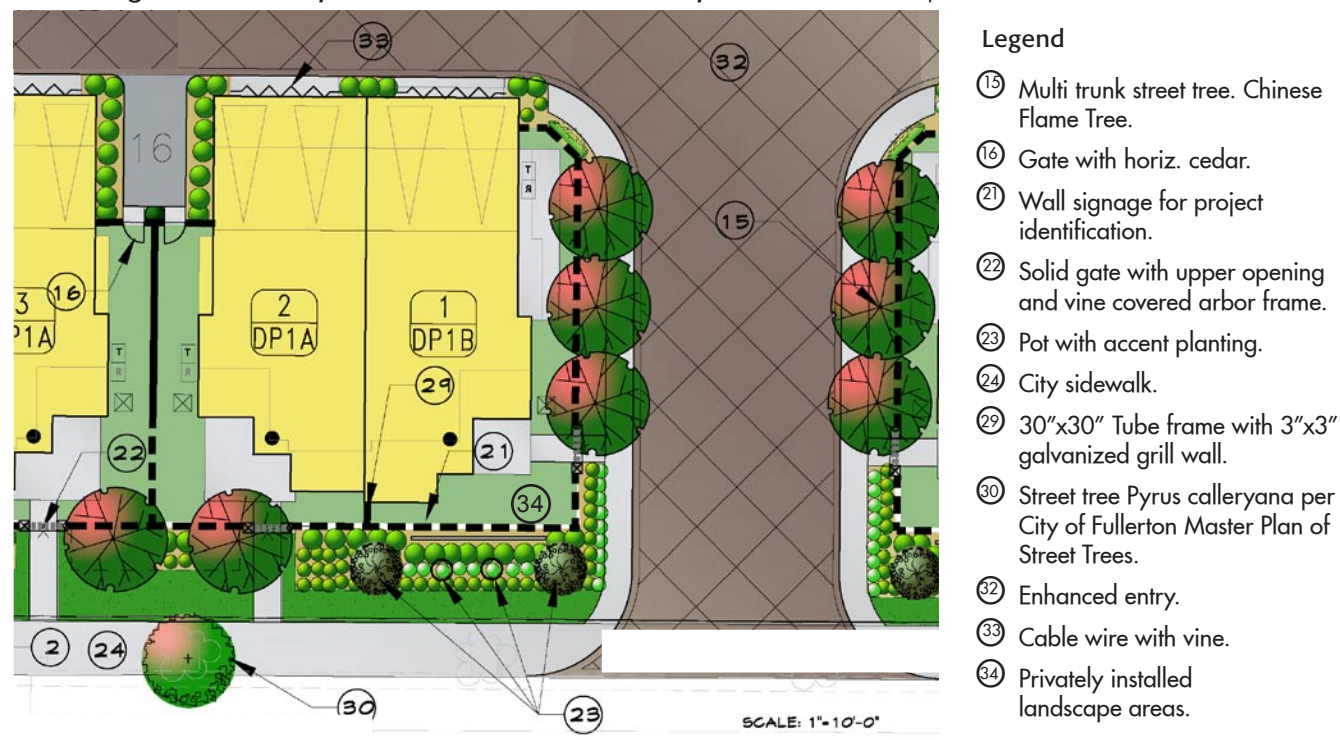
Conceptual Attached Home Landscape Plan
